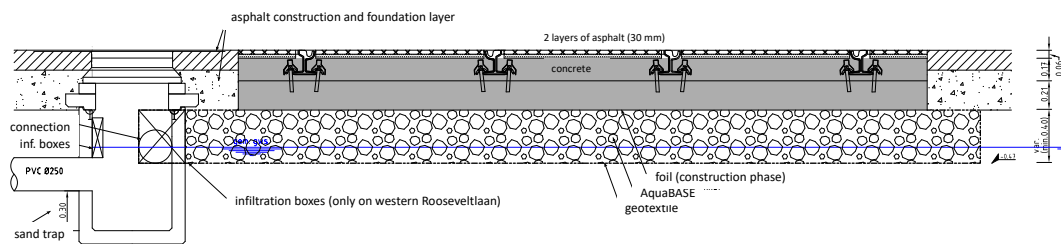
Cross-section of the tram tracks in the Rooseveltlaan.
